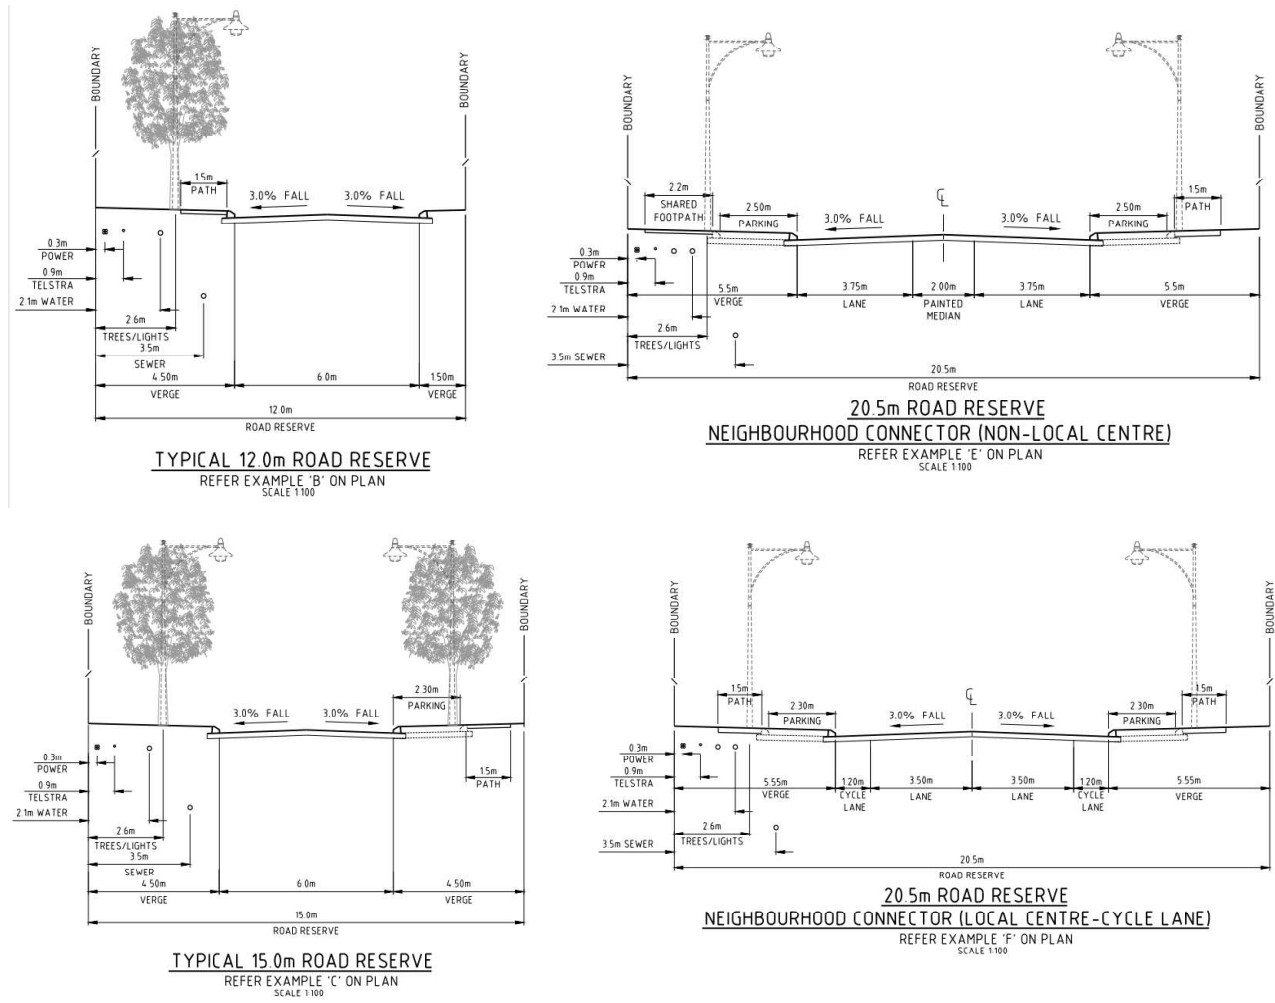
Proposed Stage 2 Road Cross Sections (C&W)
